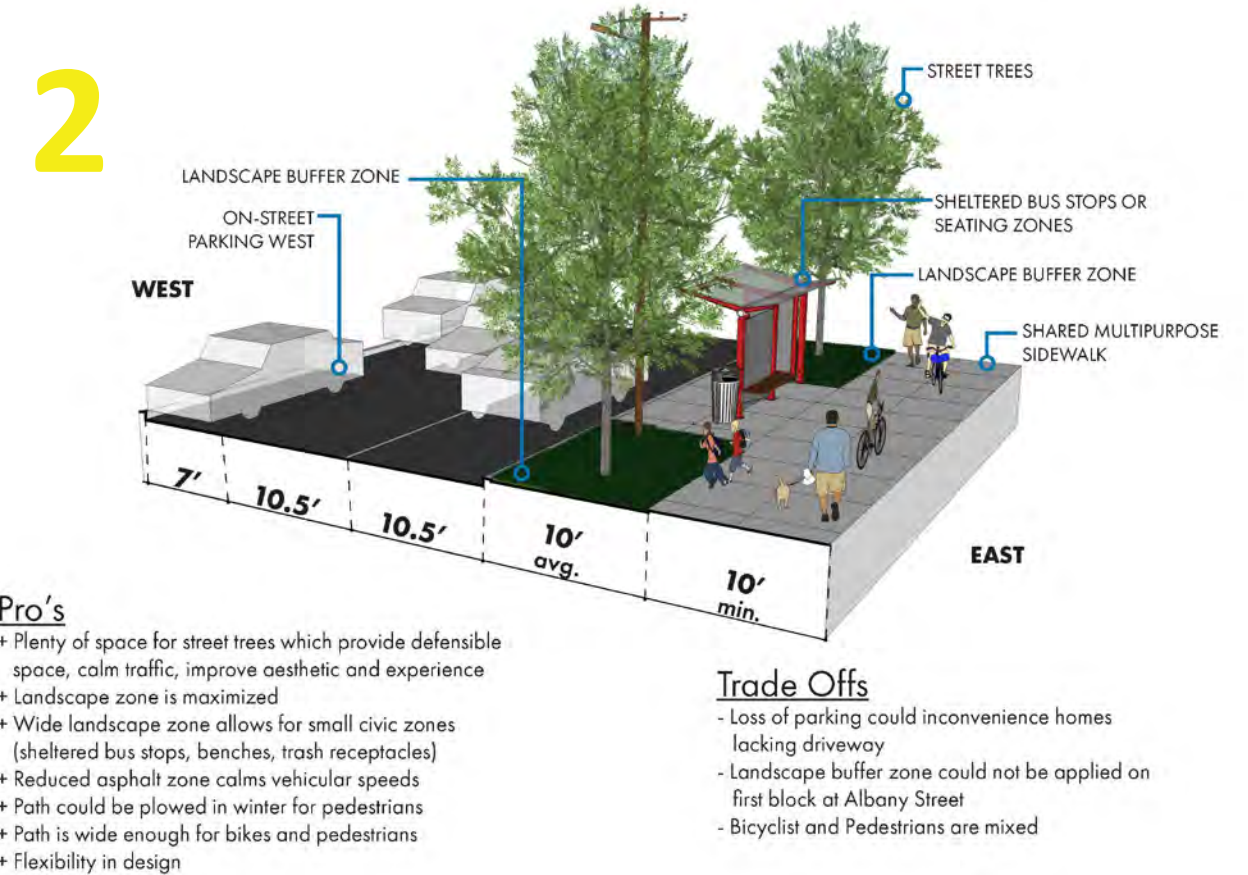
Craig Street Option 2: On Street Parking West and Multi-Use Trail East
